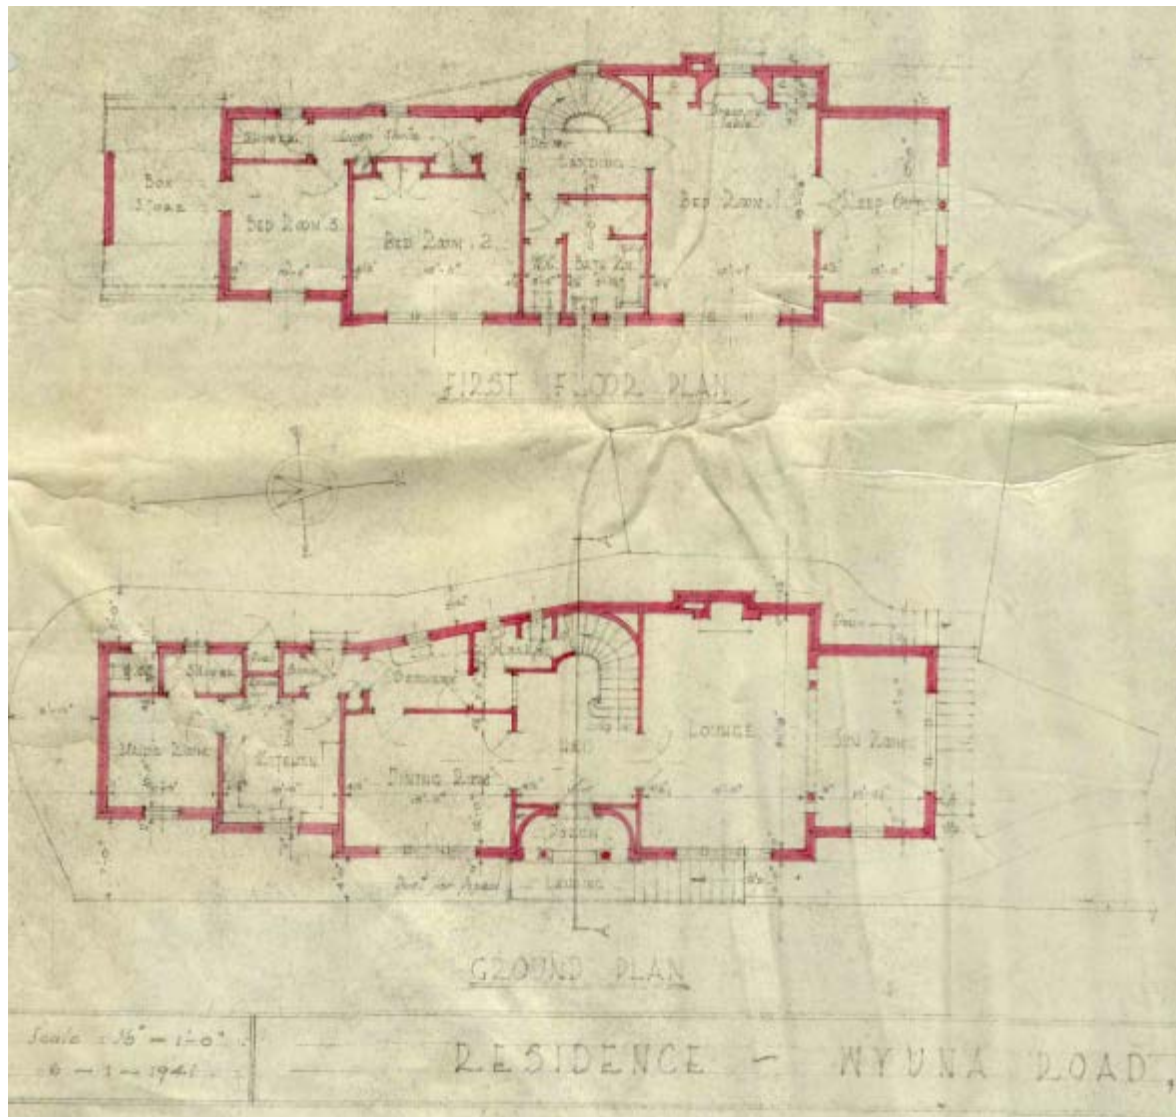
1941 plan of proposed dwelling house at 30 Wyuna Road, Point Piper (Source: WMC)
